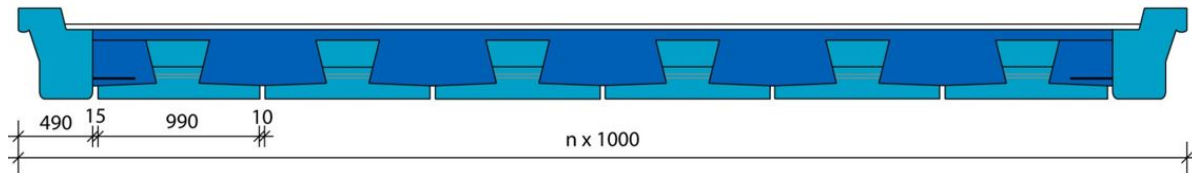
Solid deck with in-filled beams. Source: Lecture slides CIE5127 Concrete Bridges [10]
